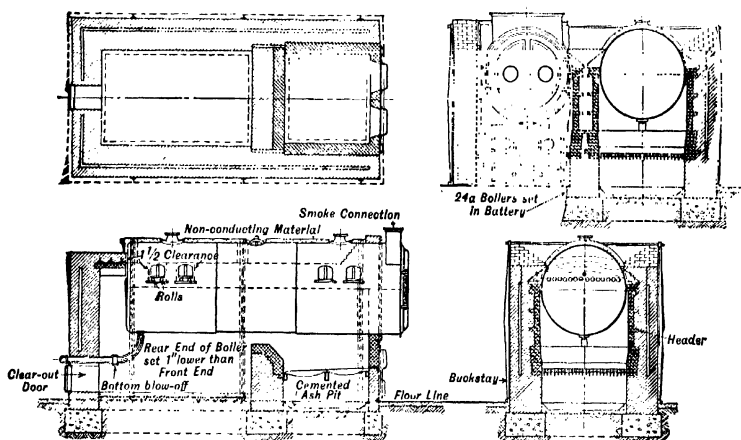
Setting for Horizontal Return-tubular Boiler.
